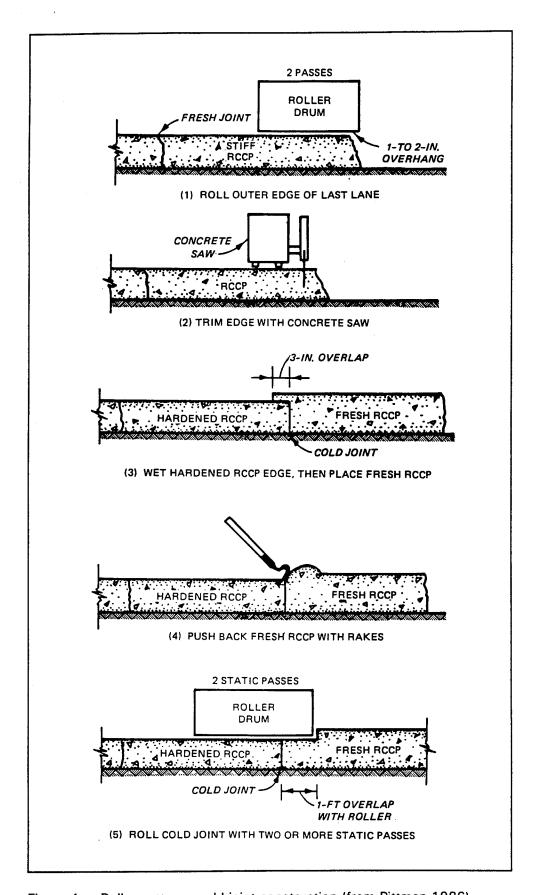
Roller pattern: cold joint construction (from Pittman 1986)
